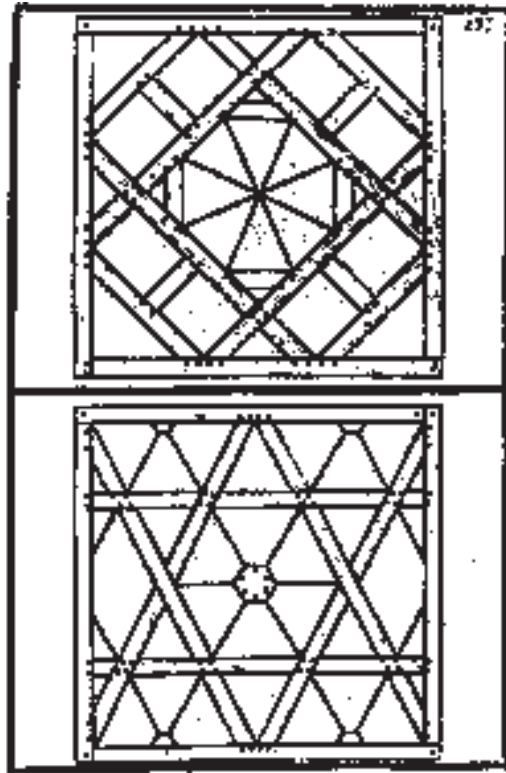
Richards' translation of le Muet's *Palladio*. Parquetry design used for Queen Henrietta Maria's rooms at Somerset House, London, 1661–62. Possibly the earliest use of parquetry in England (Temple Newsam)
